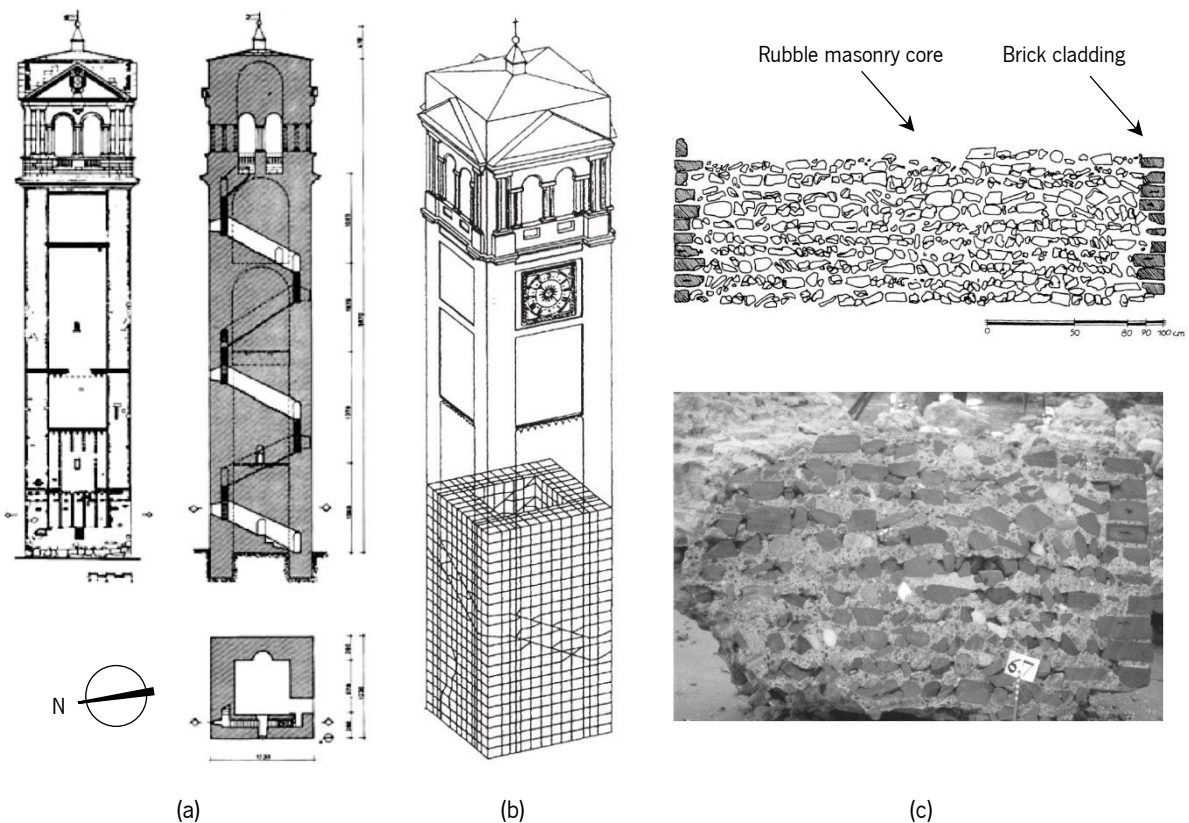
Civic Tower of Pavia, Italy: (a) geometric survey; (b) outlook of the tower and finite element mesh of the original model by Binda et al. (1992); (c) cross-section of the wall and detail of a retrieved wall fragment showing the external brick cladding. Images adapted from Ferretti & Bazant (2006a), and Binda et al. (2007).
